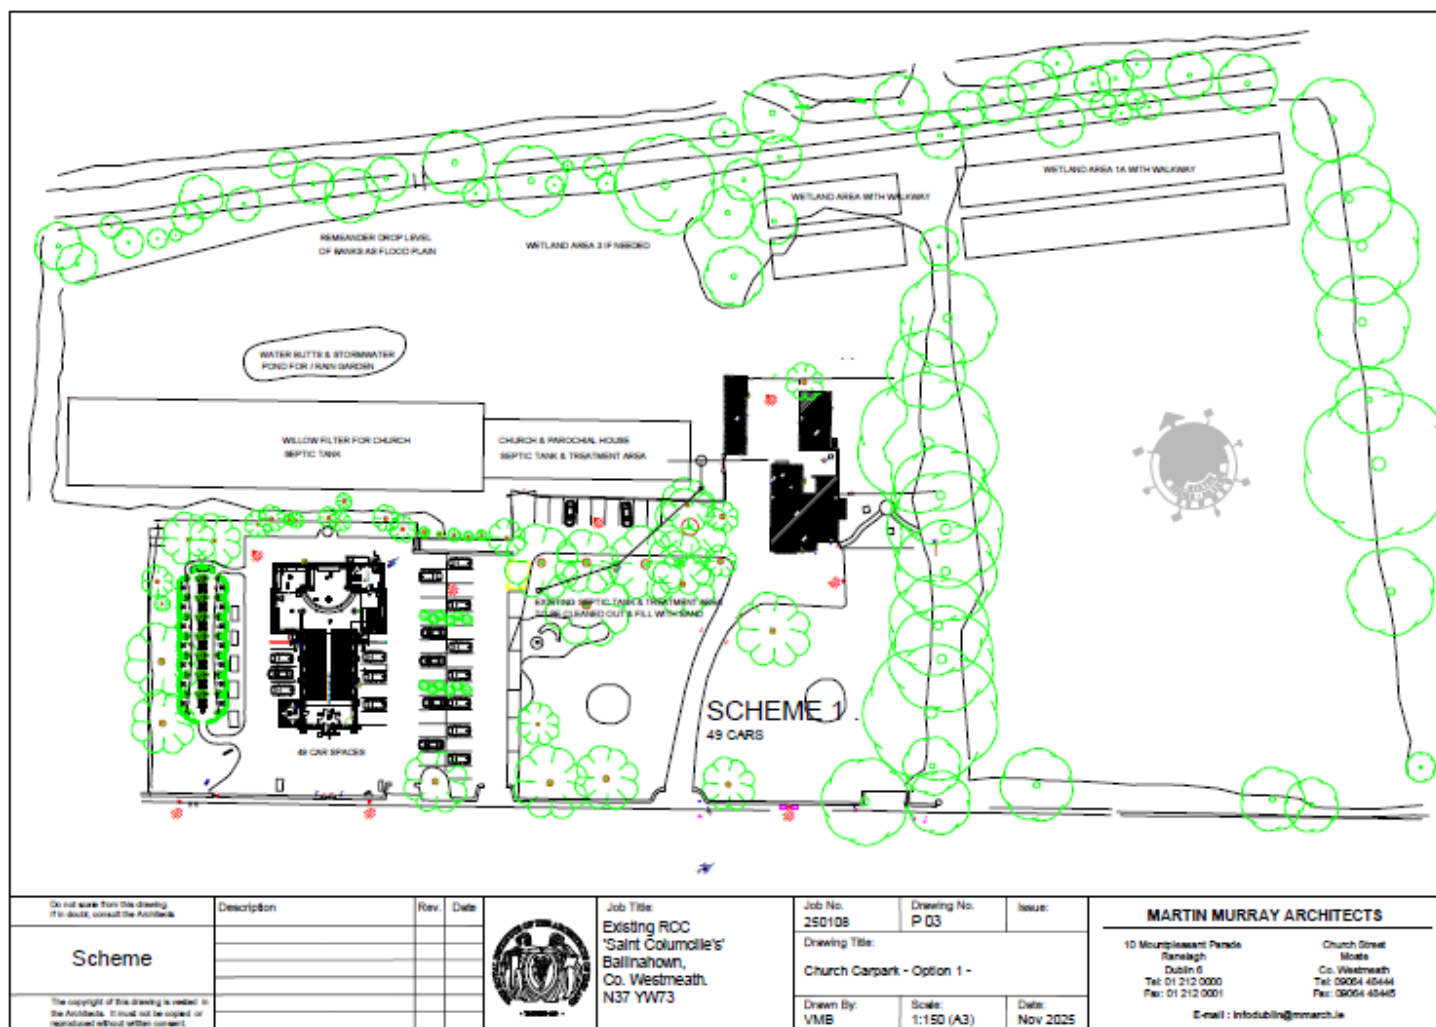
Proposed long term site profile, reflecting bio based surface water drainage for the village as a whole, and foul drainage for the site.
